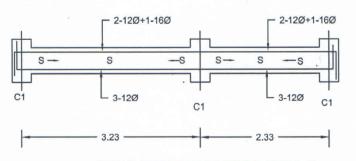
# DETAILED DRAWING OF REINFORCEMENT OF BEAMS AT PLINTH/ROOF LEVEL
